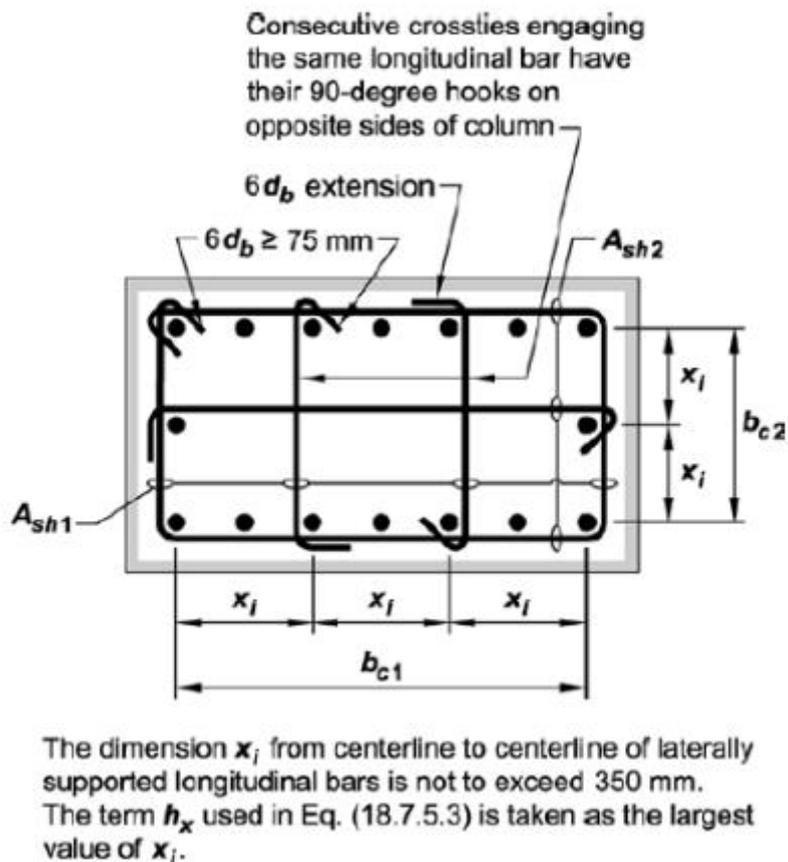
ACI318-14/Fig R18.7.5.2 Examples Of Transverse Reinforcement In Columns
